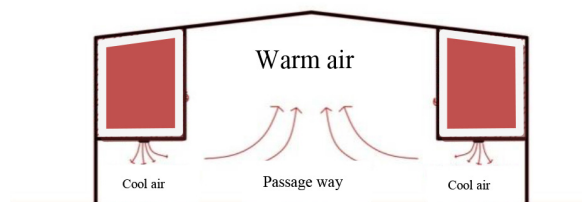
The Architectural Proposed Section of Industrial Buildings
